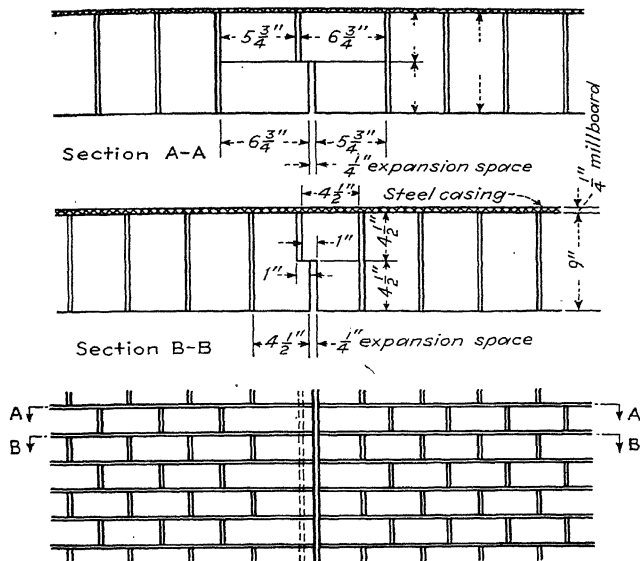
Expansion joint arrangement, 9-in. thick insulating firebrick wall. (Courtesy of Babcock & Wilcox Company.)
